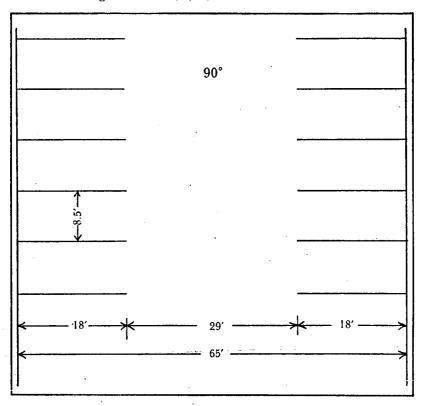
Space and Aisle Dimensions for Parking at Various Angles.
